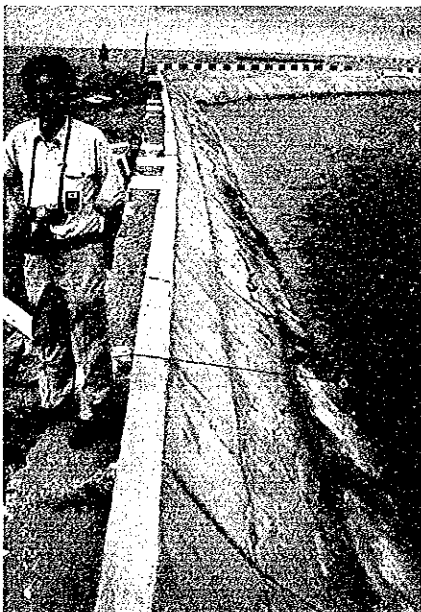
Cracks of Retaining Wall at New Port
